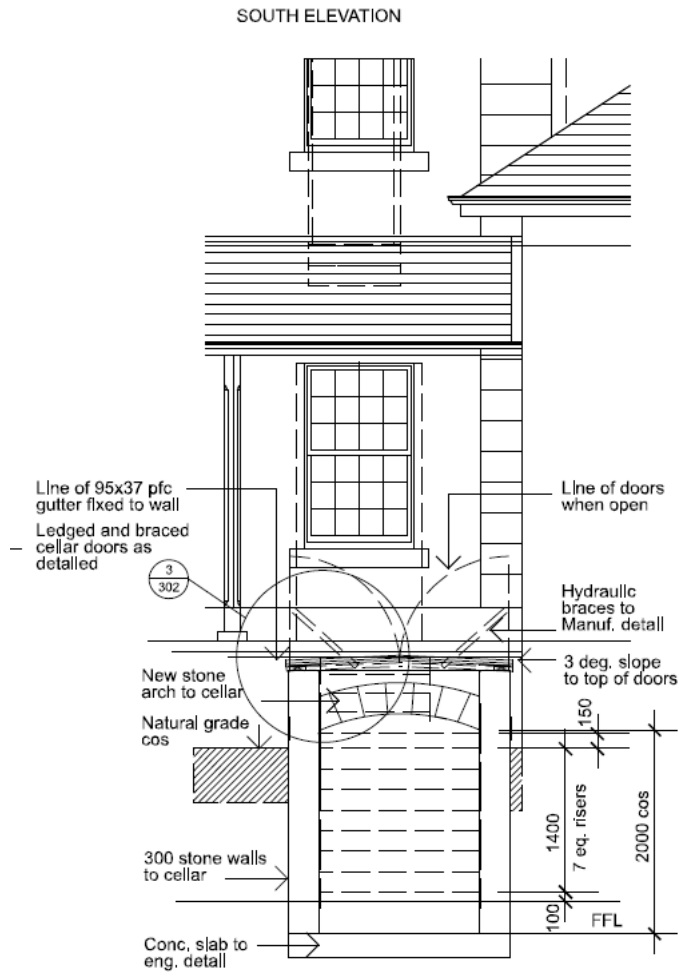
Detailed part of the south elevation where the cellar door is proposed
